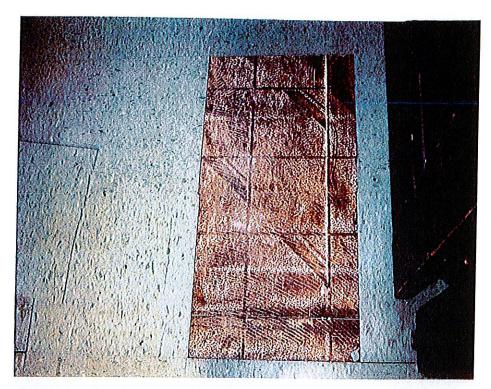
Location of samples S13, S14 and S15 (green, floor tiles,  $2^{rd}$  floor) and S28, S29 & S30 (vinyl sheet flooring) for asbestos testing. This material did not contain asbestos.
